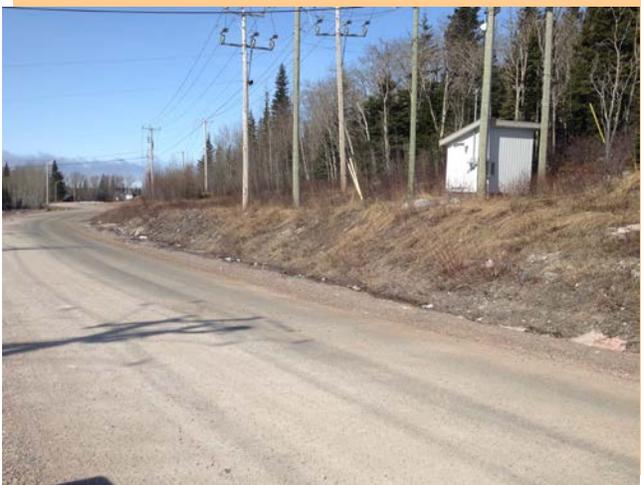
1+200 Culvert required if rock is excavated from the ditch
